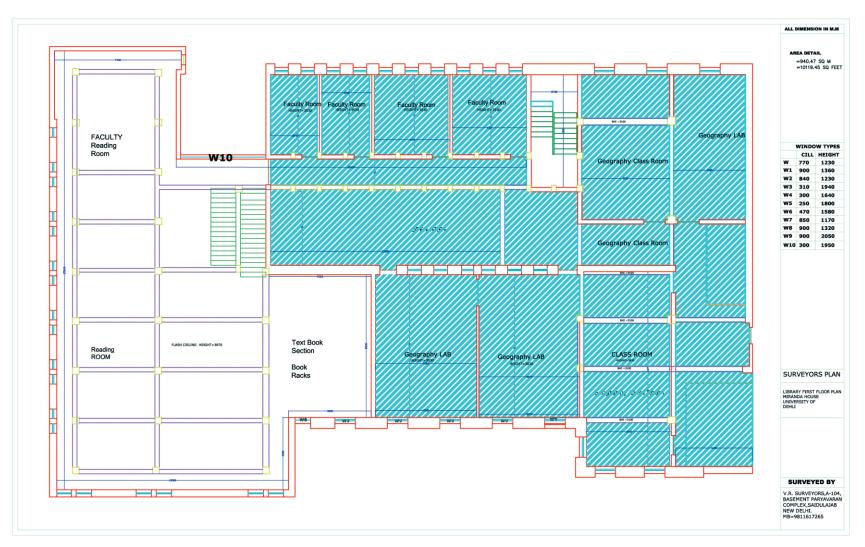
(e): Layout plan of MH Library: First Floor
